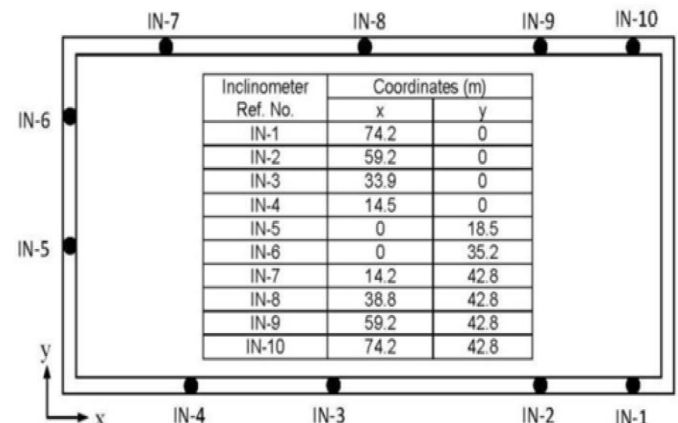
Plan view of excavation shape and inclinometers arrangement of case KLCC (Law et al. 2016)
